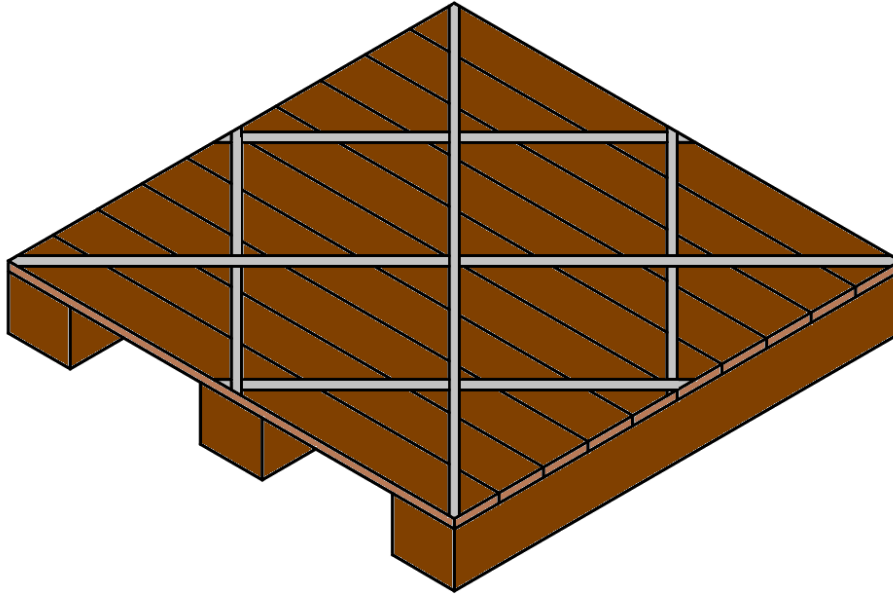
Reinforced timber floor by adding light steel sheets.
